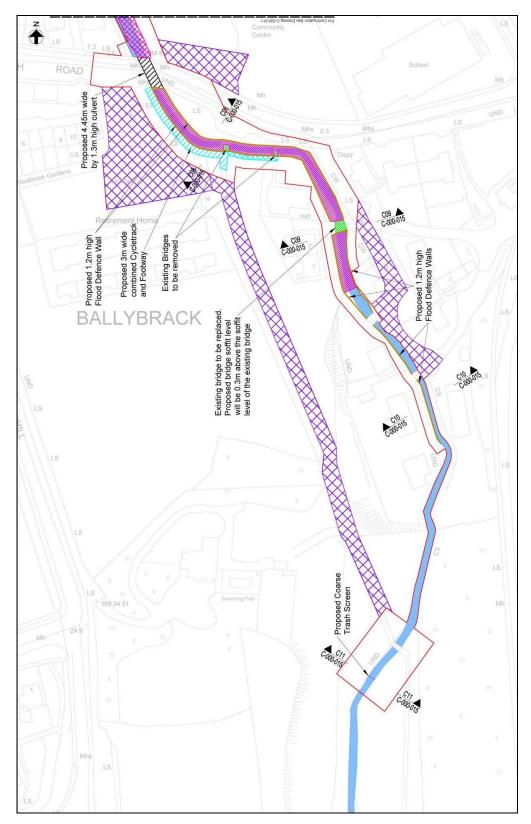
Proposed works to Ballybrack Stream, Ravensdale and Ballybrack Woods,
